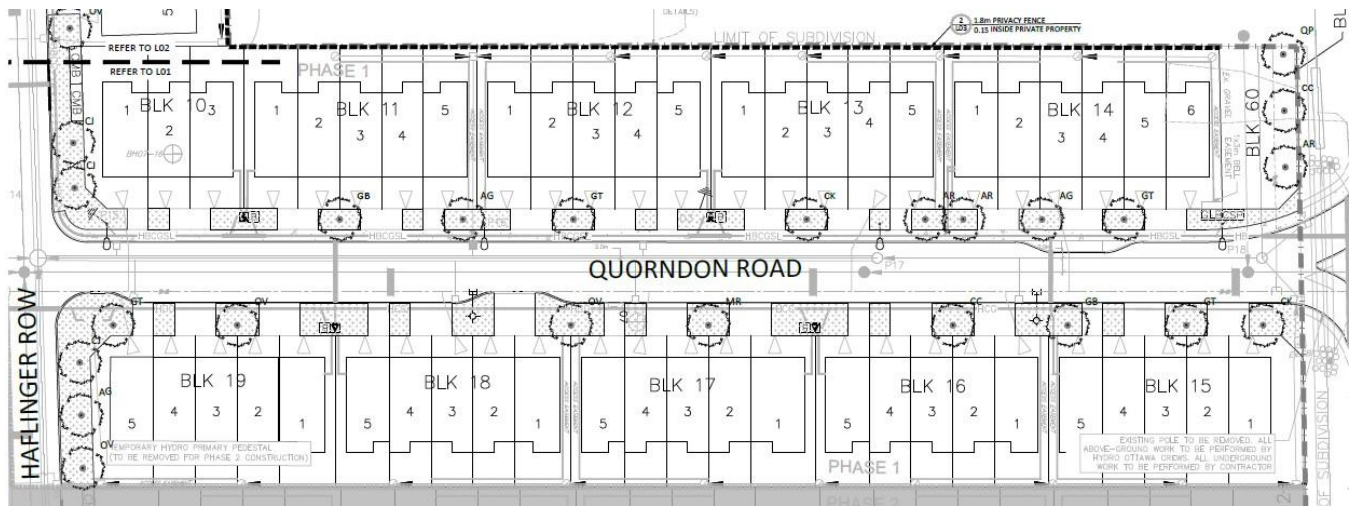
Preliminary Streetscaping Plan along Quorndon Road
